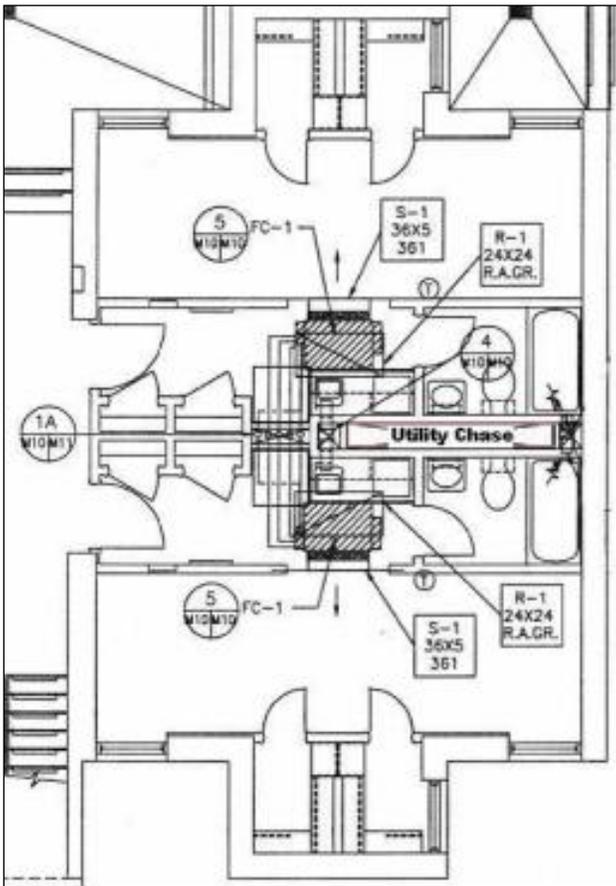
Floor plan of occupant rooms (two rooms shown).
